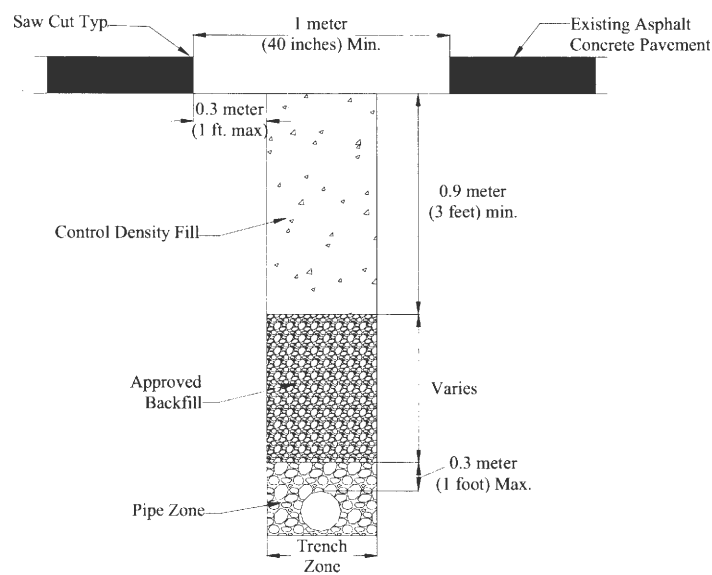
Typical trench from WSDOT cross-section using cdf as backfill material (from WSDOT).
